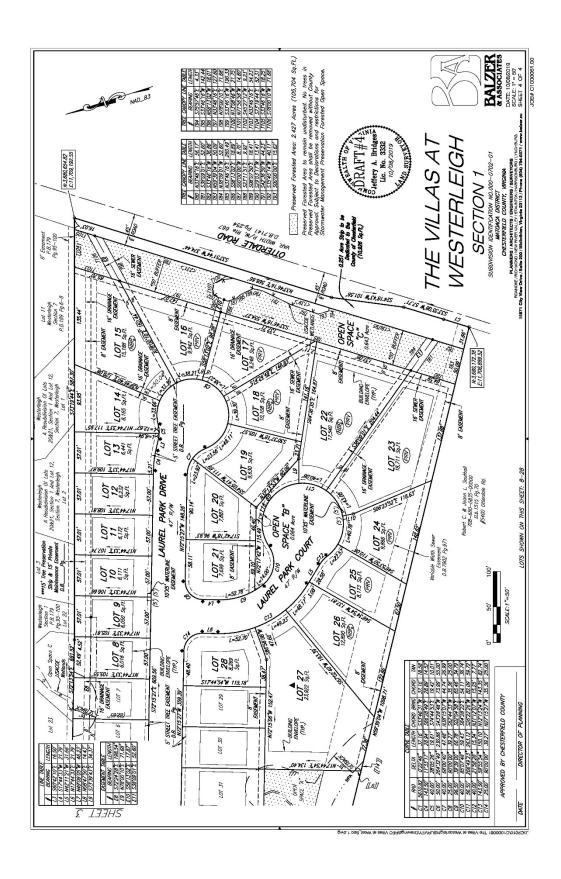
EXHIBIT A – VILLAS AT WESTERLEIGH LAYOUT
